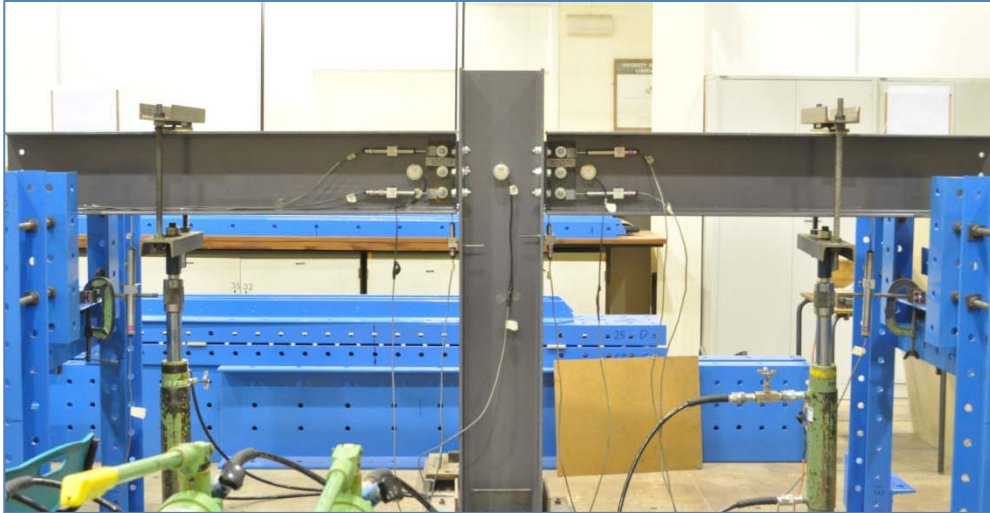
General test arrangement for the steel web cleated beam-to-column joint tests.
